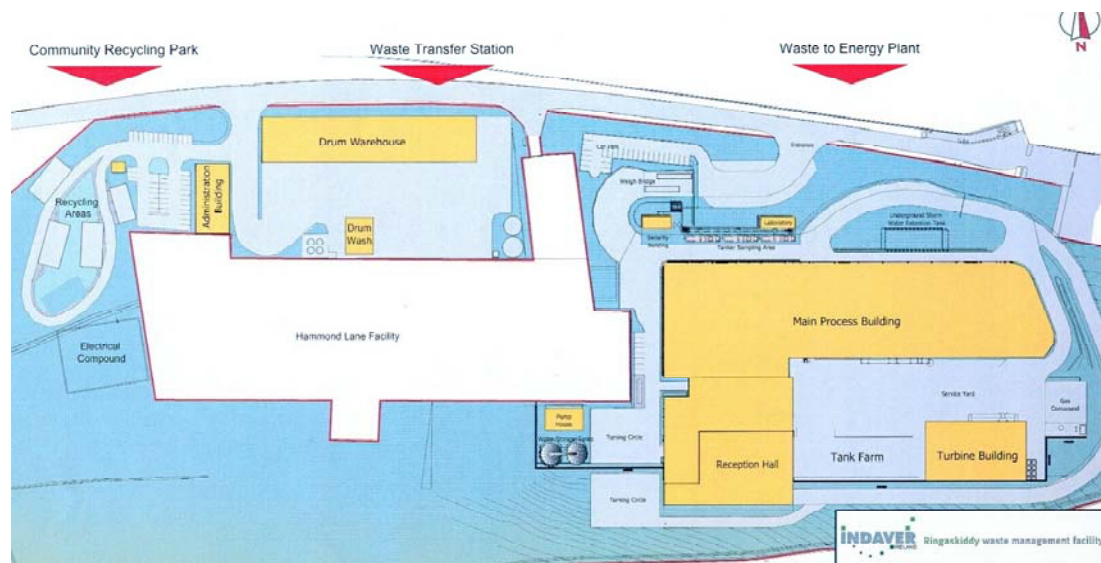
Indaver Ringaskiddy Waste Management Facility - Site Layout
